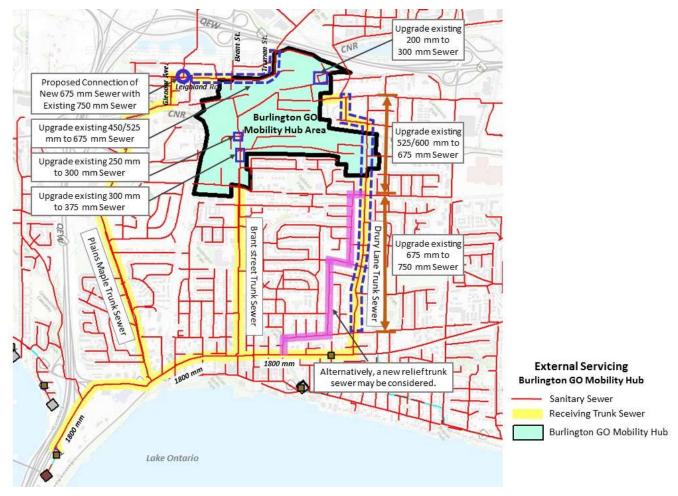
Proposed External Sewer Improvements - Burlington Go MTSAs
